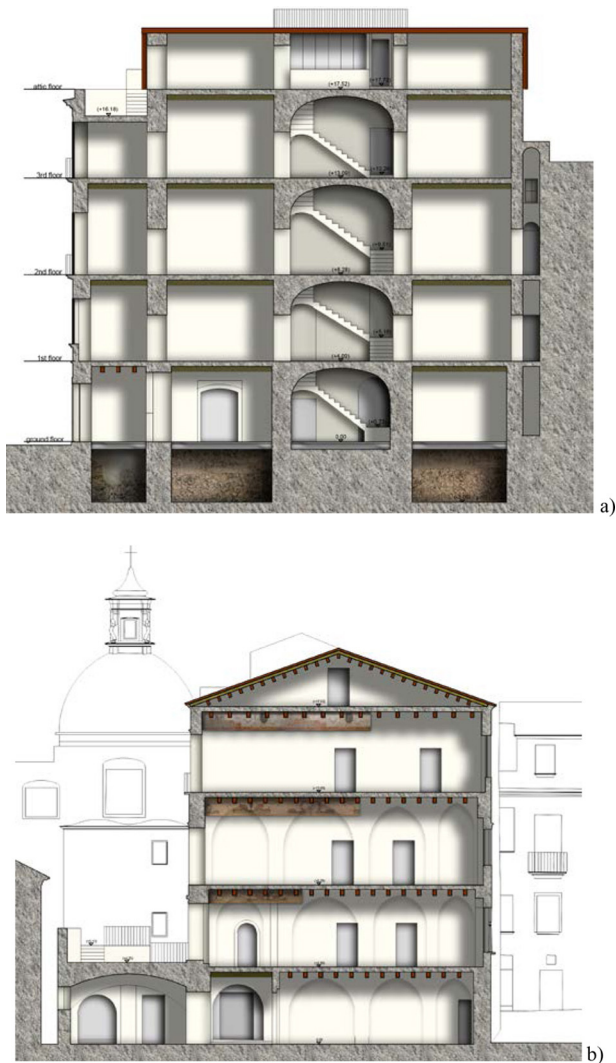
Building sections: a: longitudinal section; b: cross section.
